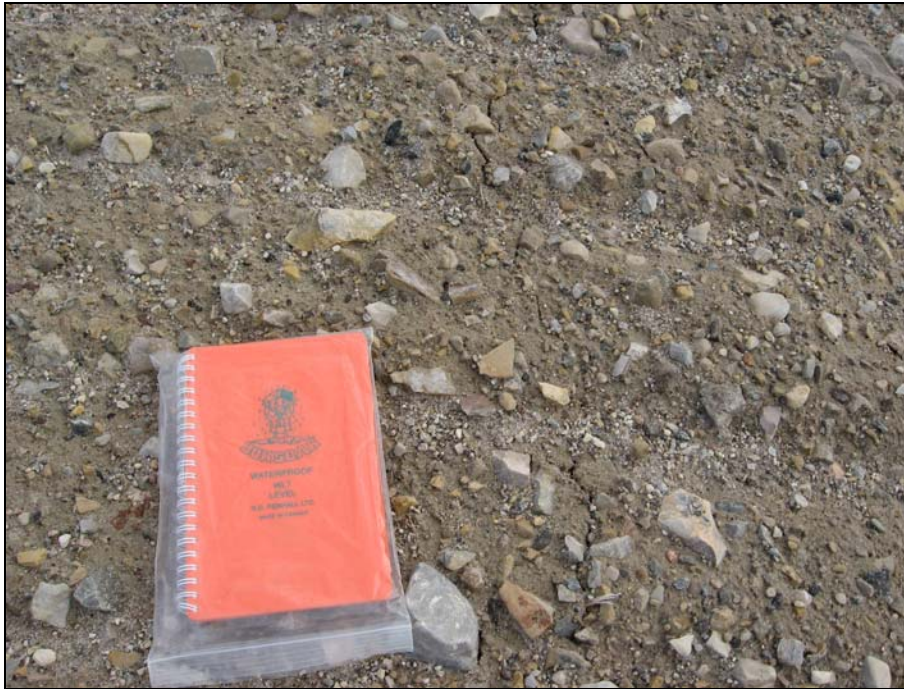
Tension crack appears to end, possibly infilled with sediments, about 4m up from toe of slope. ↑
